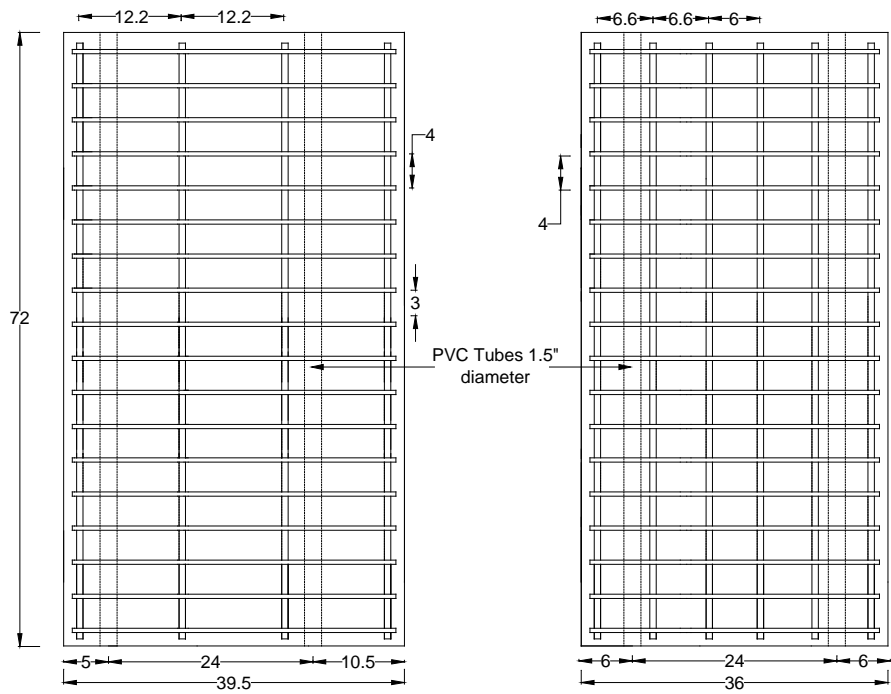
Big block reinforcement detailing for SW-1 (all dimensions in inches)
